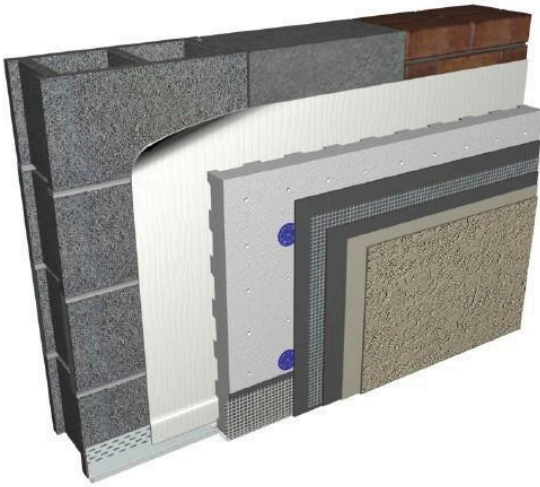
Puccs EIFS over modified bituminous membrane on masonry, concrete, and brick
